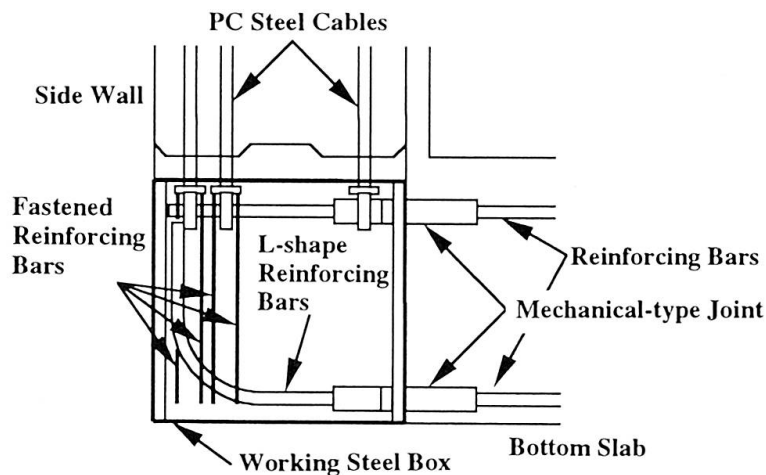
Layout for Strengthening Reinforcement Bars of Corner Joint
